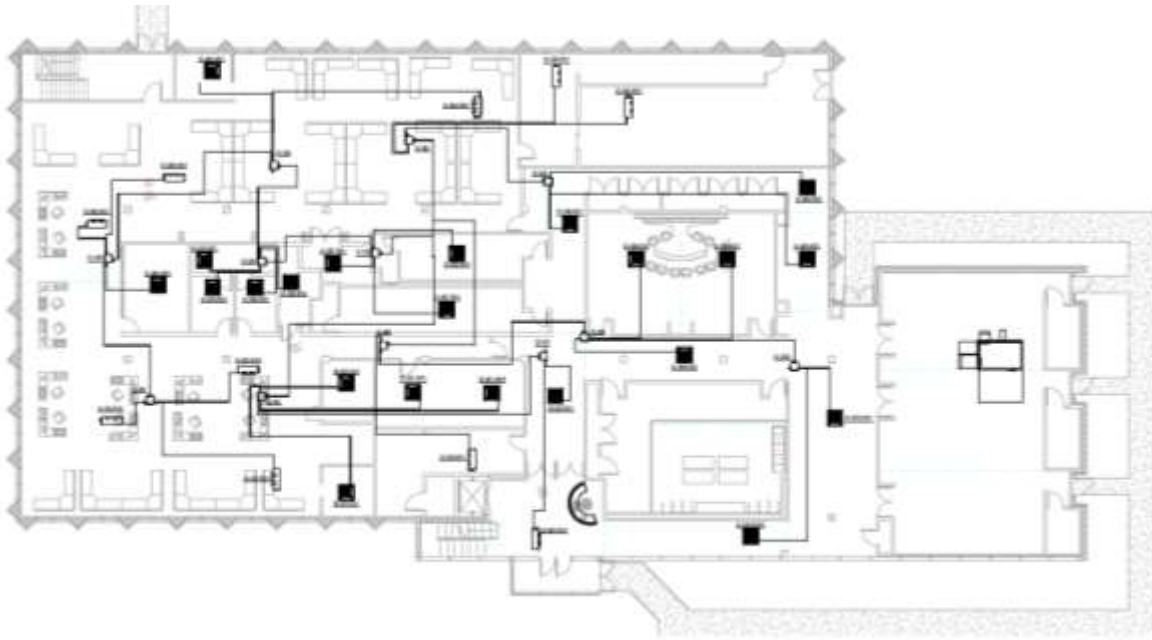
Example of Revit Piping Diagram for VRF System-1st Floor
